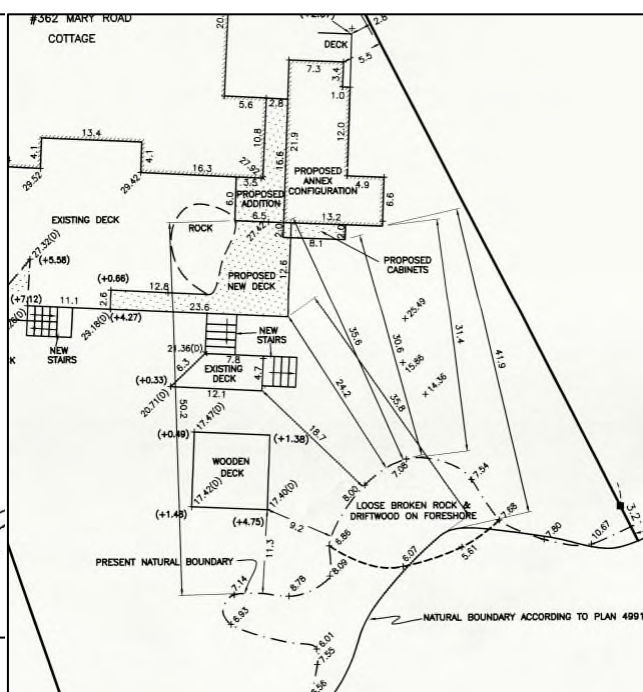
Site Plan of Proposed Alterations to Cottage Annex
